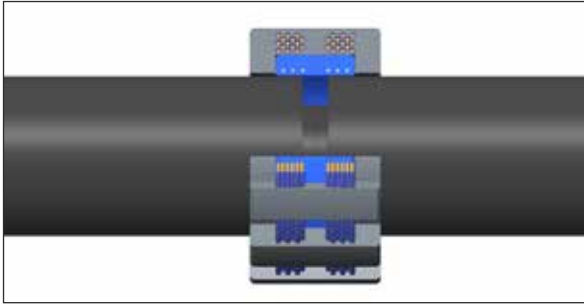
Step 8: Induction welding of outer pipe with an induction welding machine
